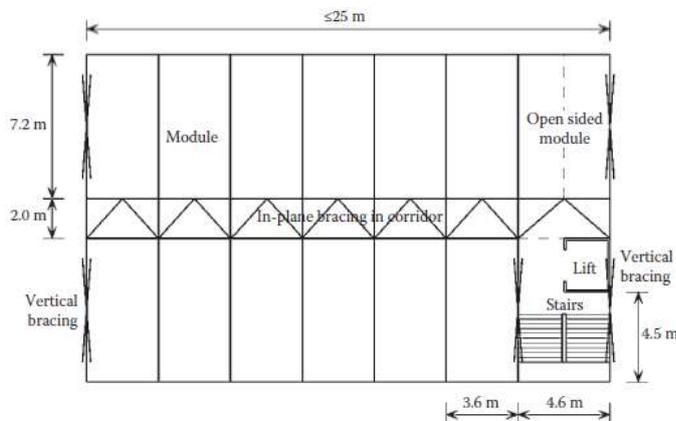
Location of vertical and horizontal bracing (Lawson et al., 2010).
